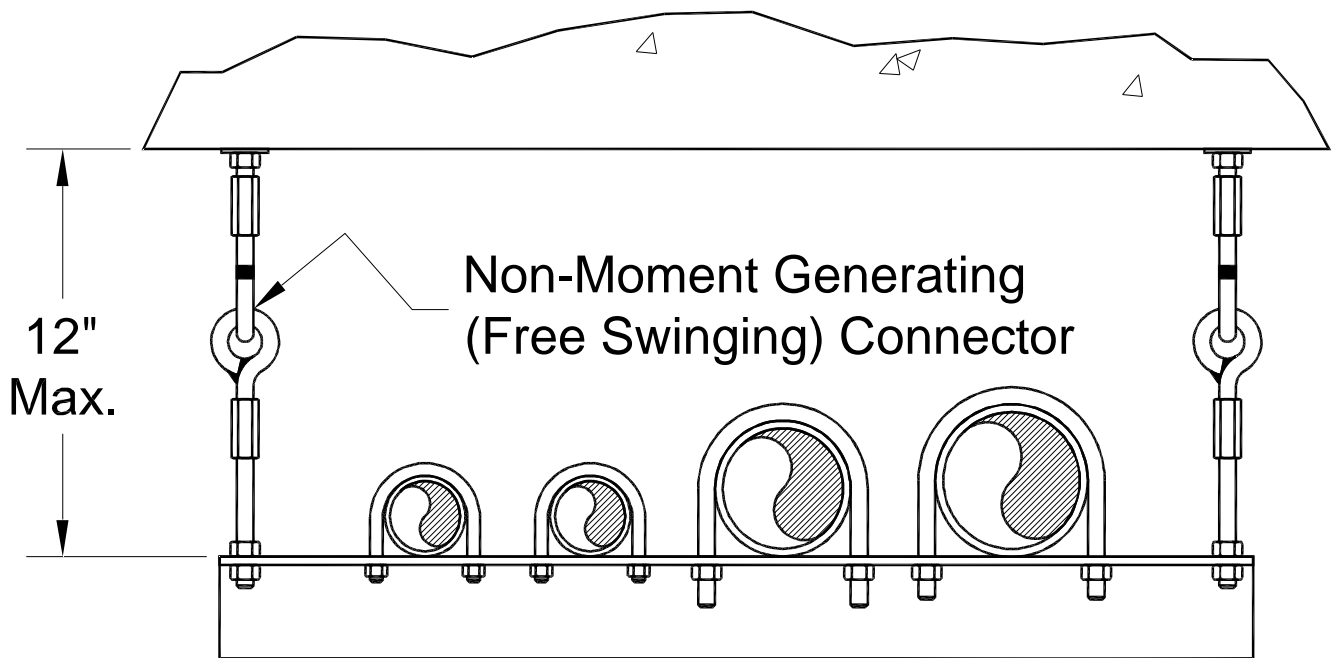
; Measurement of 12" Dimension for Trapeze Supported Pipe
